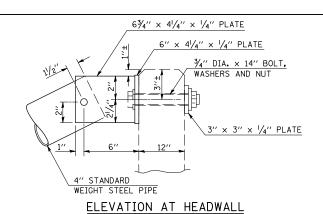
DETAIL OF GRATING FOR CONCRETE HEADWALL CULVERT NO. 6, STATION 2030 + 82.00 S.N. 010-8143
